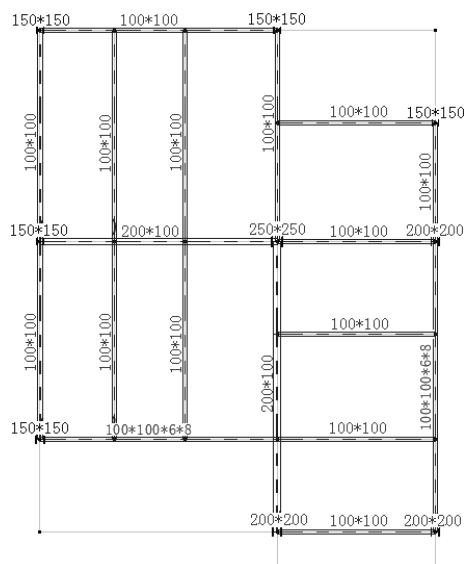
Second floor beam column layout of light-steel straw-bale structure
